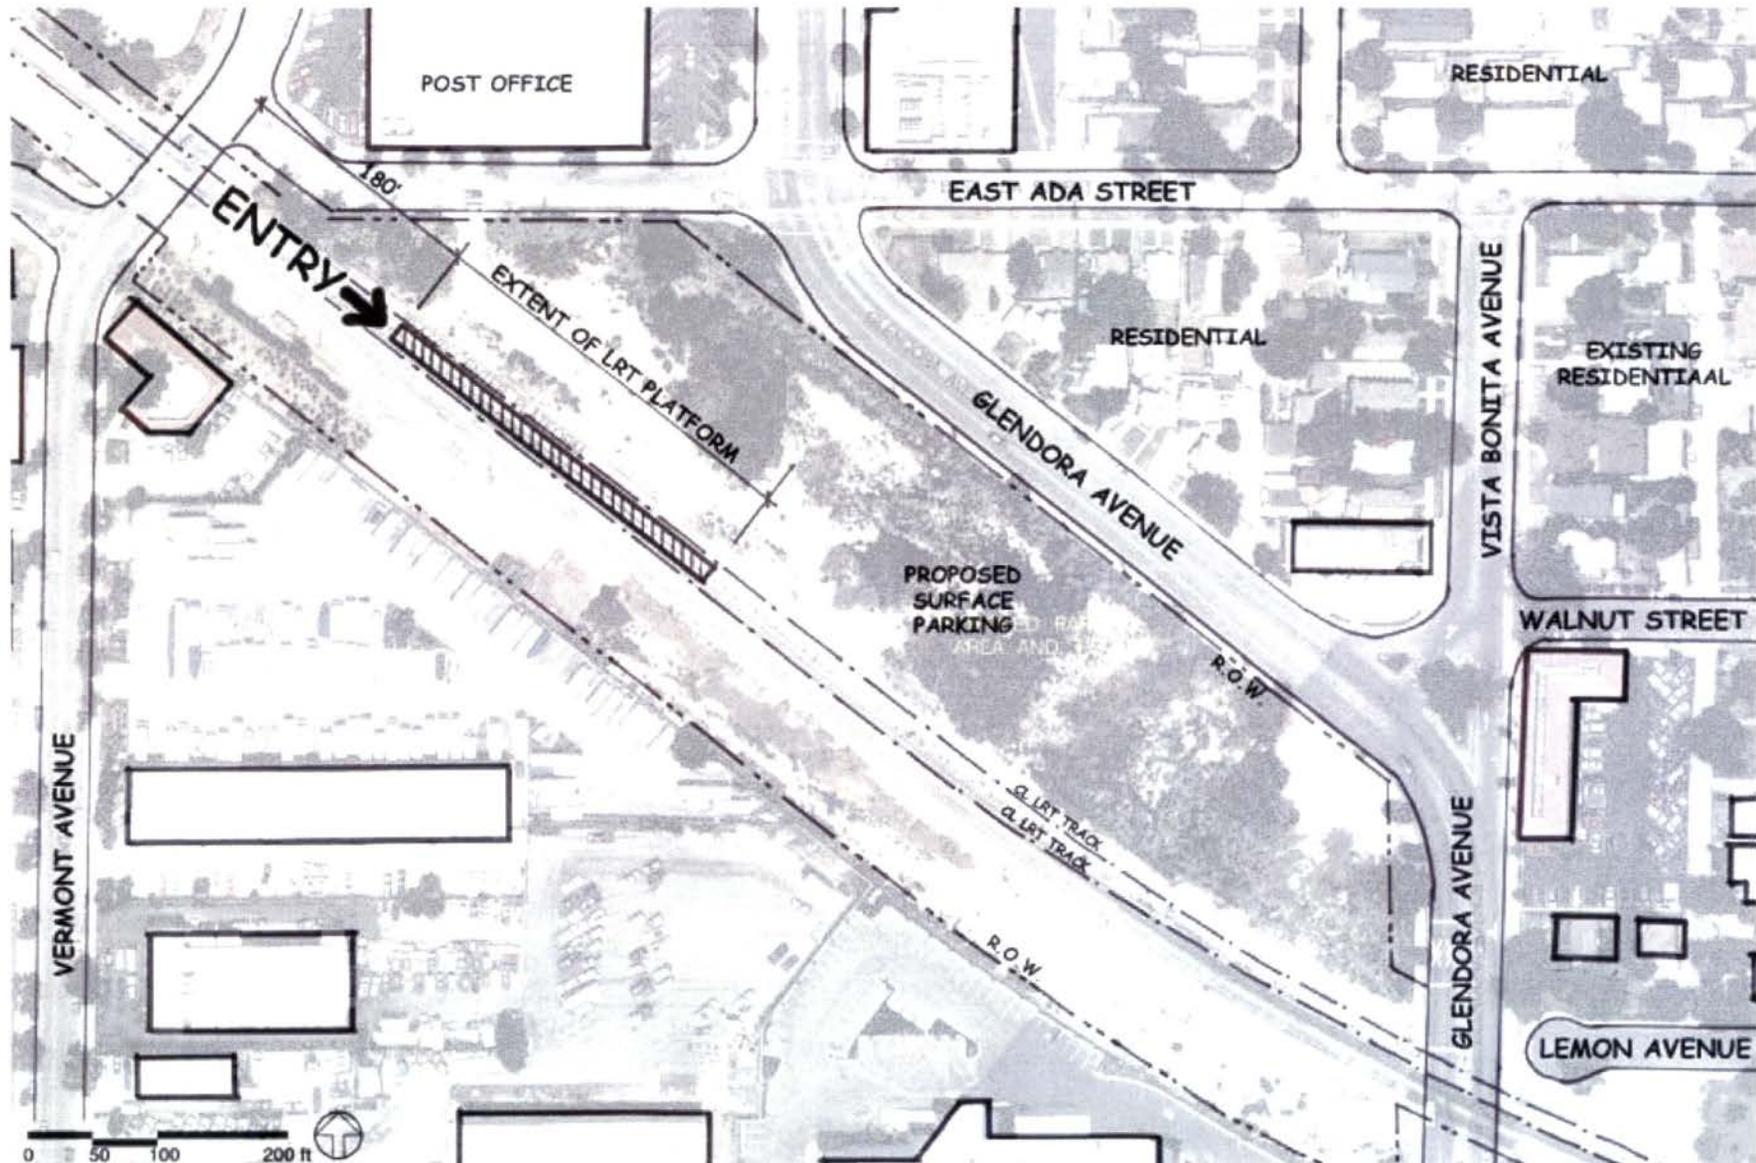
Site Plan: City of Glendora Station, 2-Track Alternative
